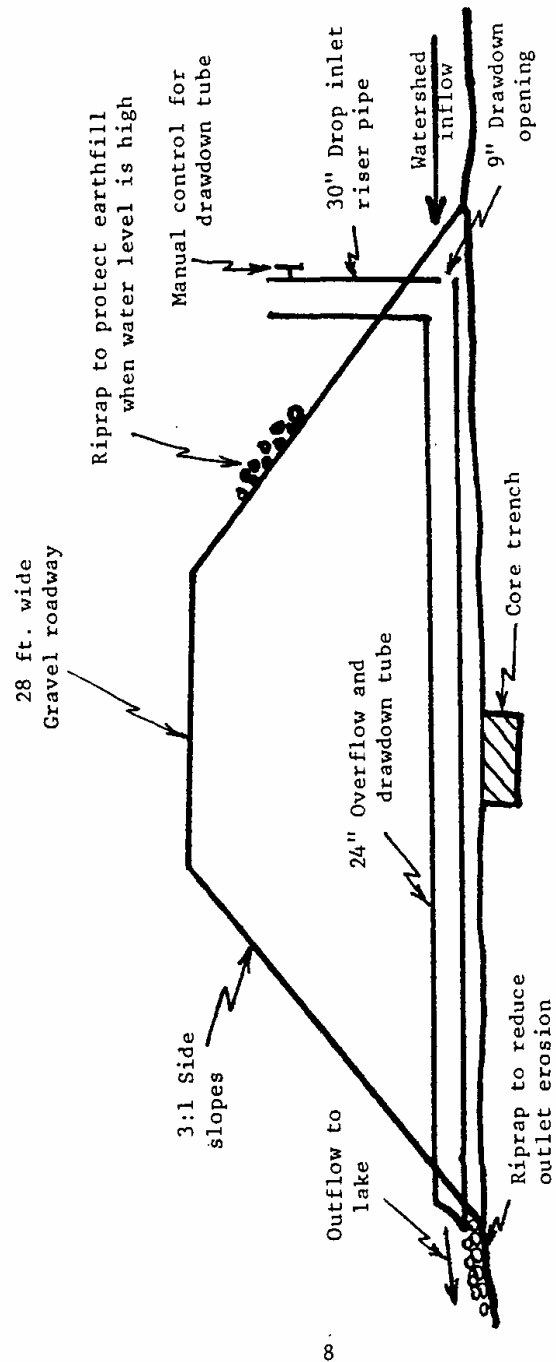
Schematic design of two sediment traps incorporated into construction of the new road.
